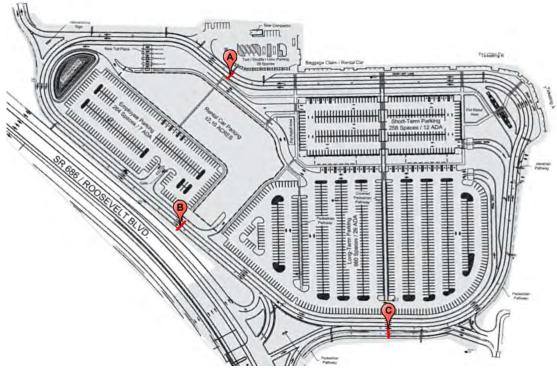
FUTURE TERMINAL AREA ROADWAYS
